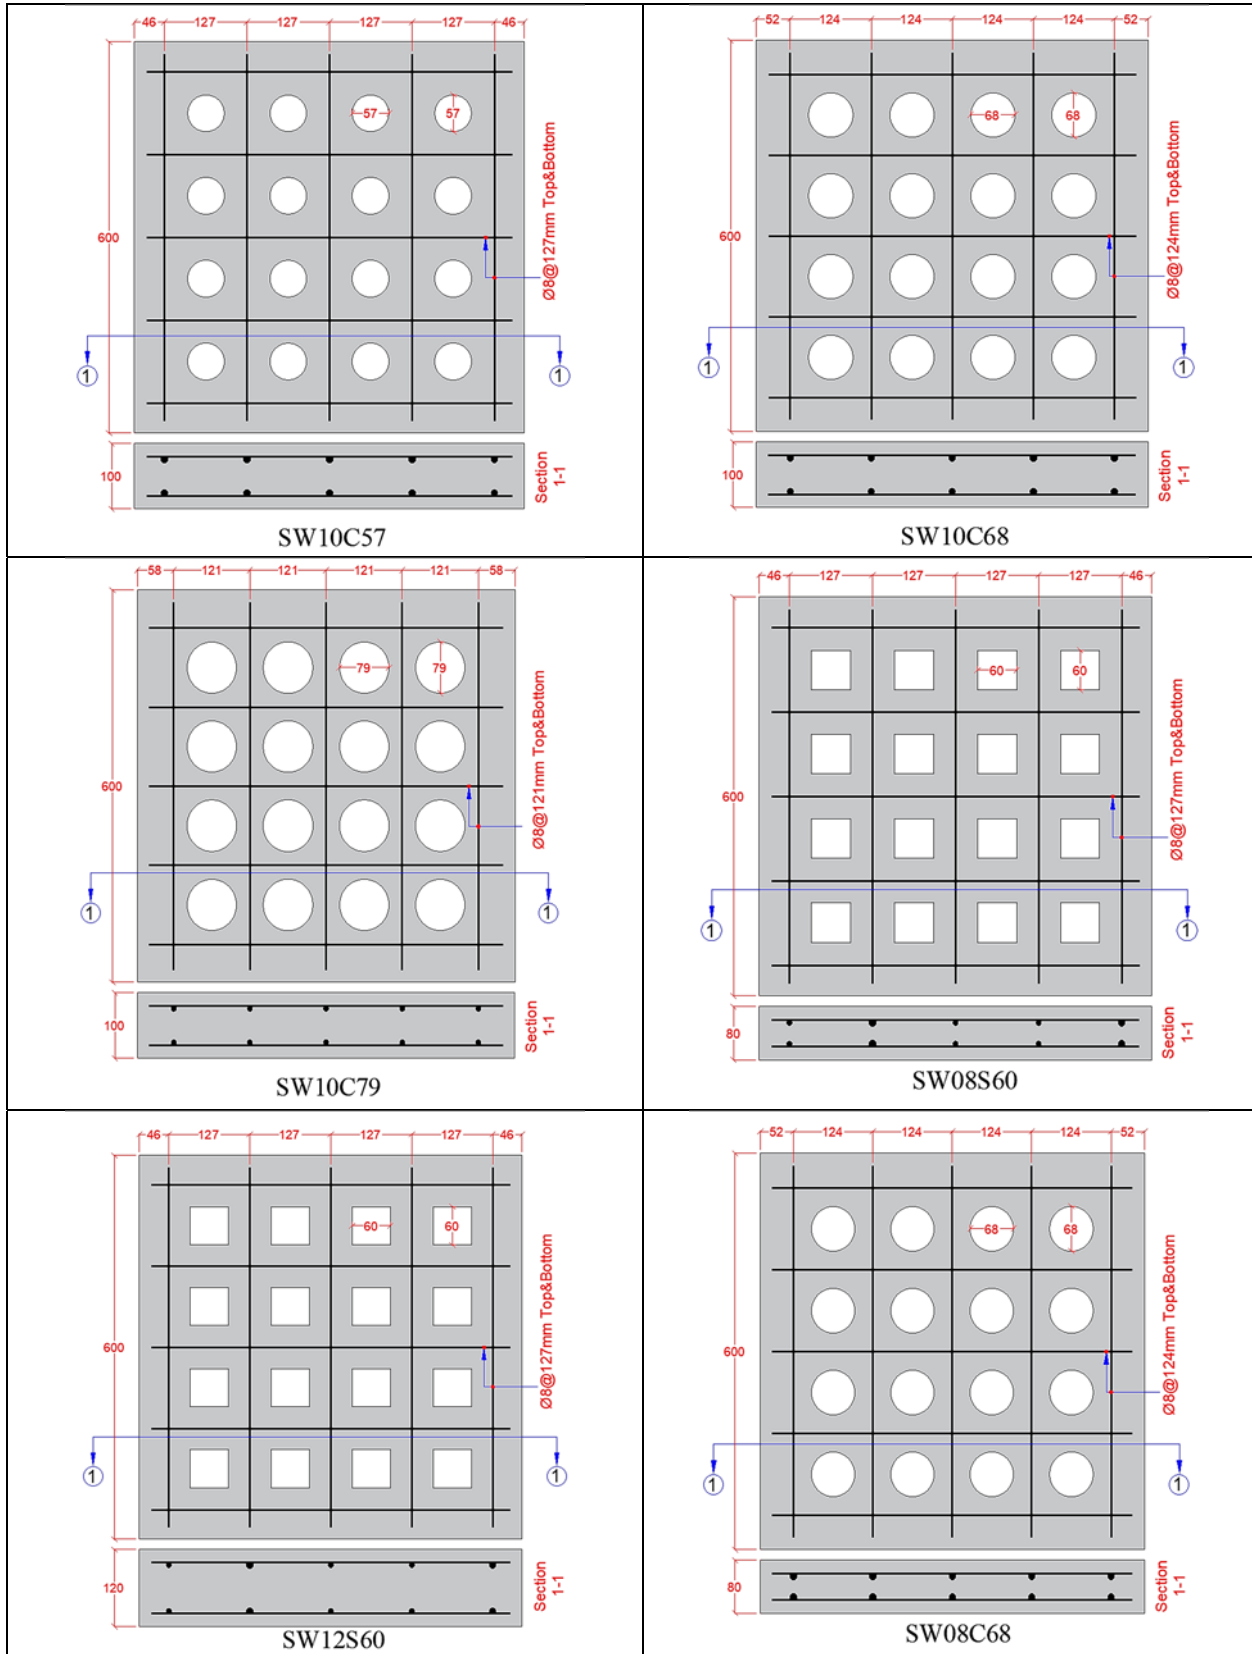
Details of specimens for models SW10C57 to SW08C68.
